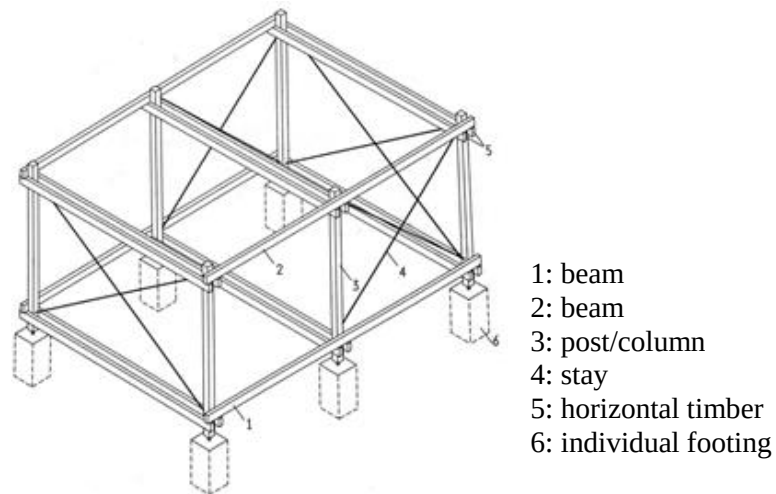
Isometric diagram of an example for a skeleton construction (tie beam joints) [2]
